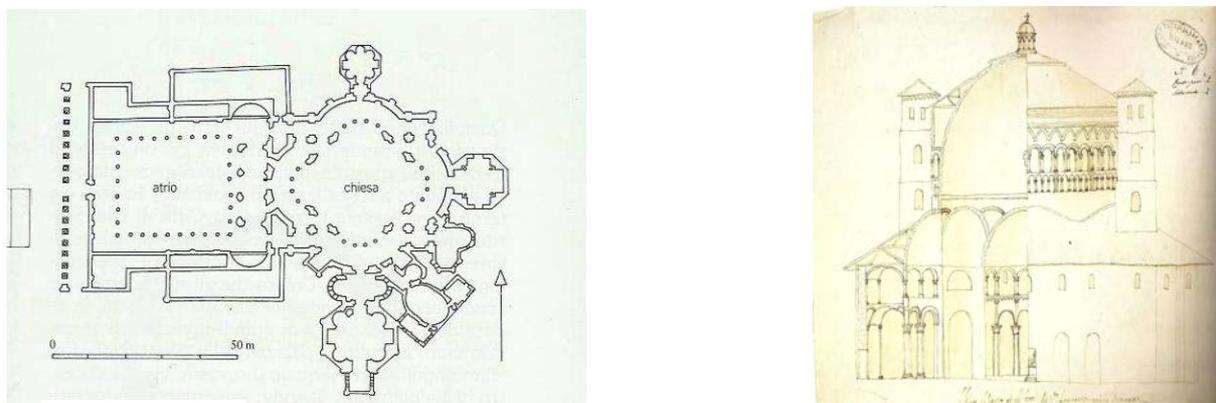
Plan and cross-section façade of the S. Lorenzo church, Milan (Italy). Adapted from [7].
